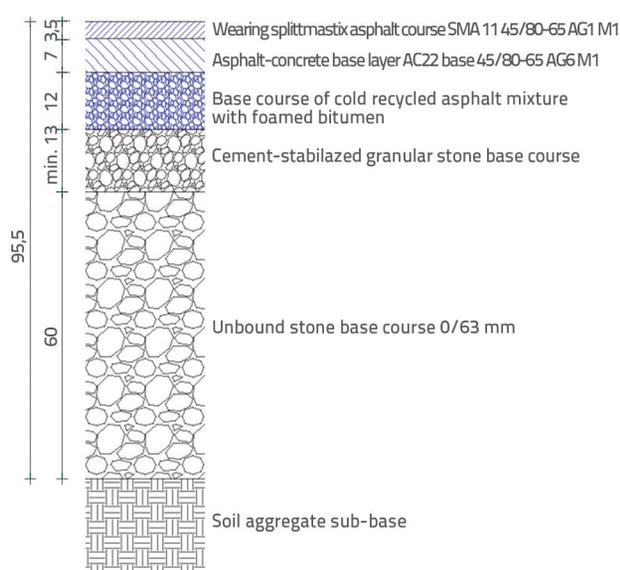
Layers of strengthened pavement structure of D28 Bjelovar bypass state road [35]
